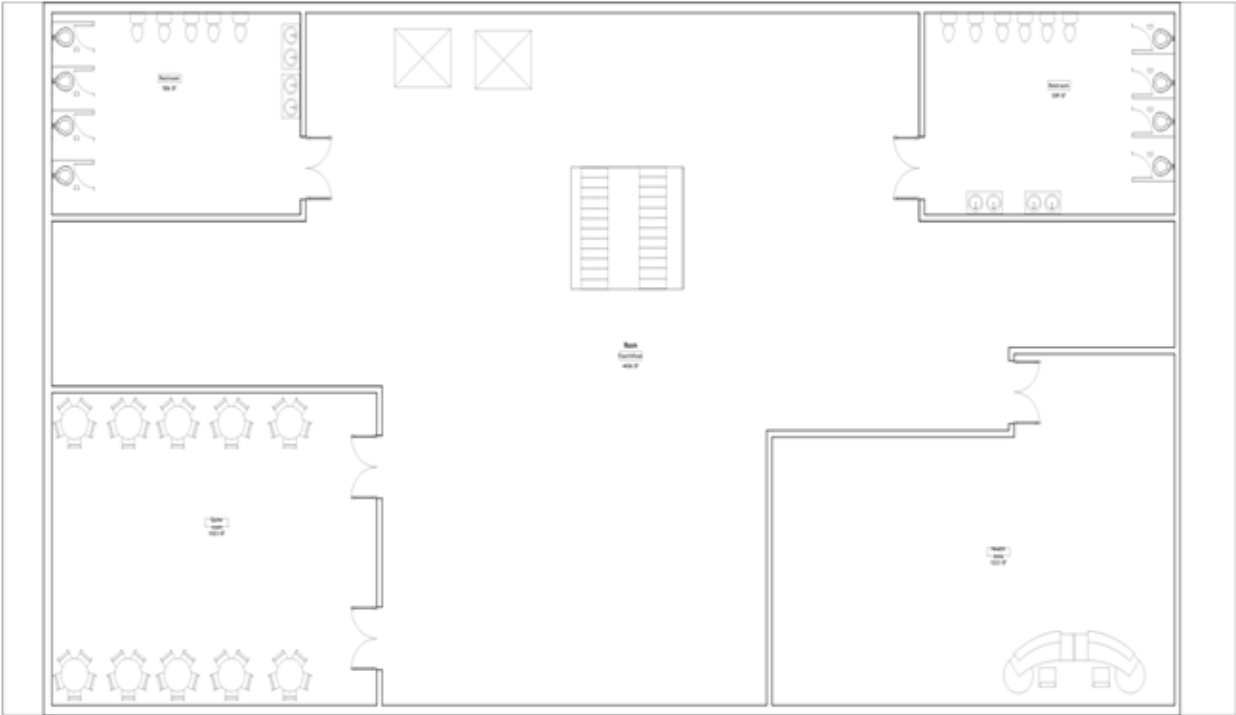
Third floor plan of the Common Grounds Student Center.
